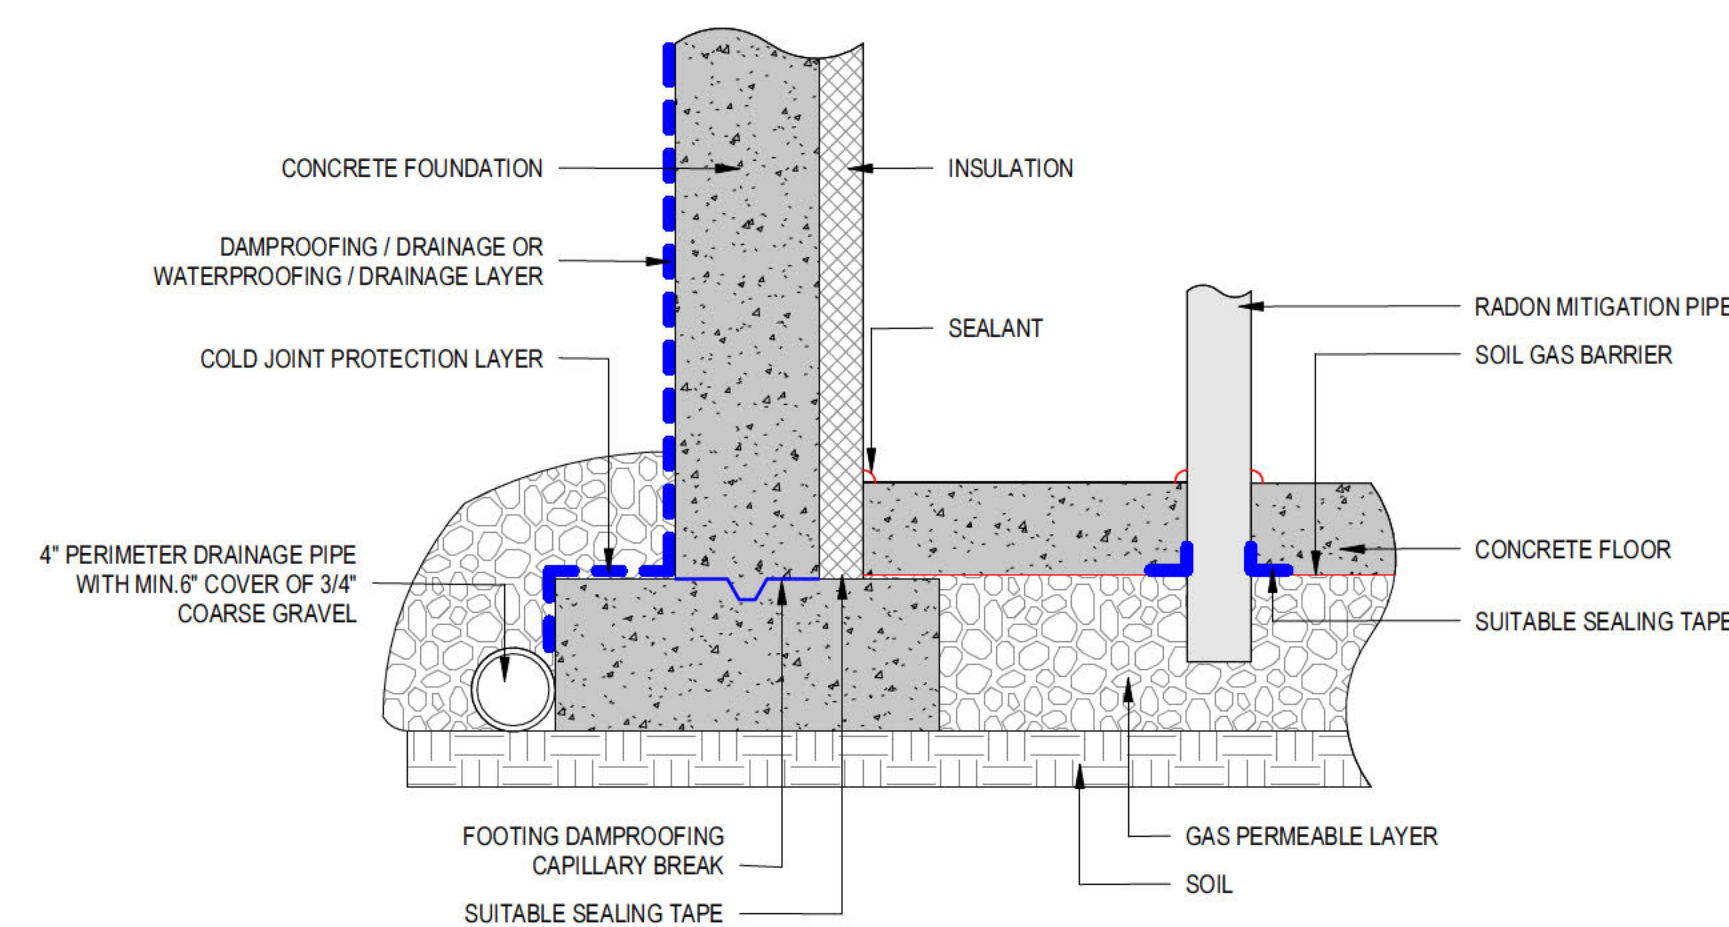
SEALING SUB-SLAB MEMBRANE HORIZONTALLY TO CONCRETE FOOTING WHEN INSULATION IS BETWEEN THE FOUNDATION WALL AND FLOOR SLAB
